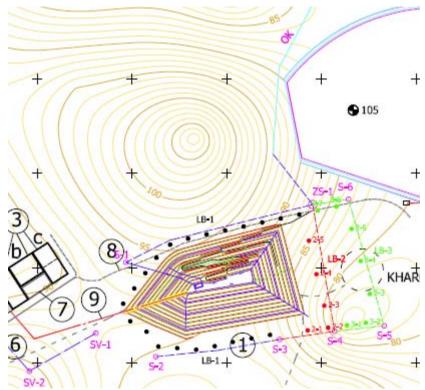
Plan of Dewatering in Stage 2 of the Mine Opening
